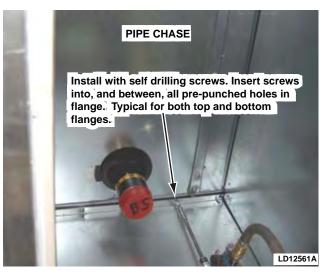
SCREW PIPE CHASE TOP AND BOTTOM INTERNAL FLANGES TO AIR HANDLER
